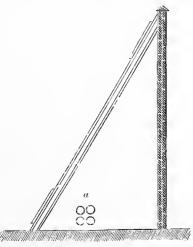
SECTION OF HOUSE OR GLASS CASE FOR COVERING PEACH AND NECTARINE TREES ON WALLS, showing (a) Position for four 3in. Hot-water Pipes.
